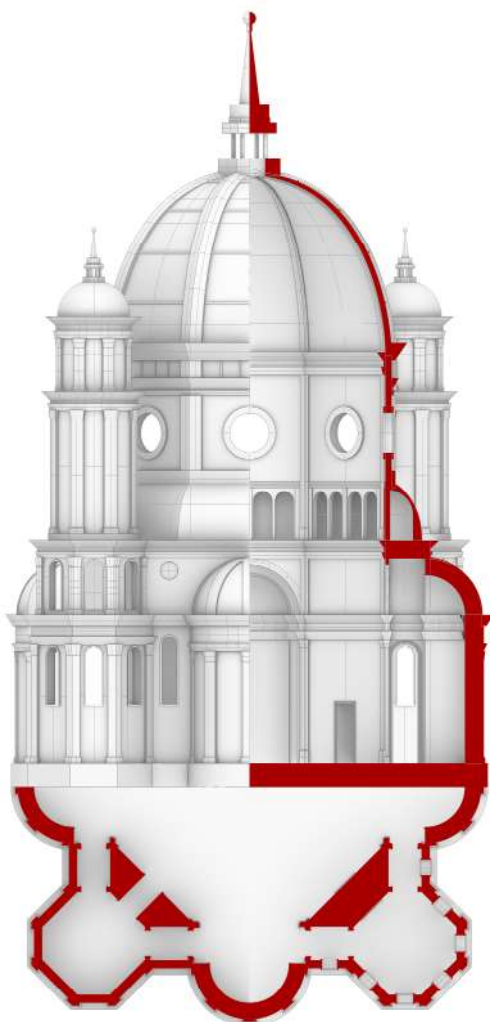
Plan, section and elevation (1:500) of the solution derived from the plan view. The plan views are obtained by sectioning the edifice at the level of the windows (on the right) and at the level of the doors (on the left).
